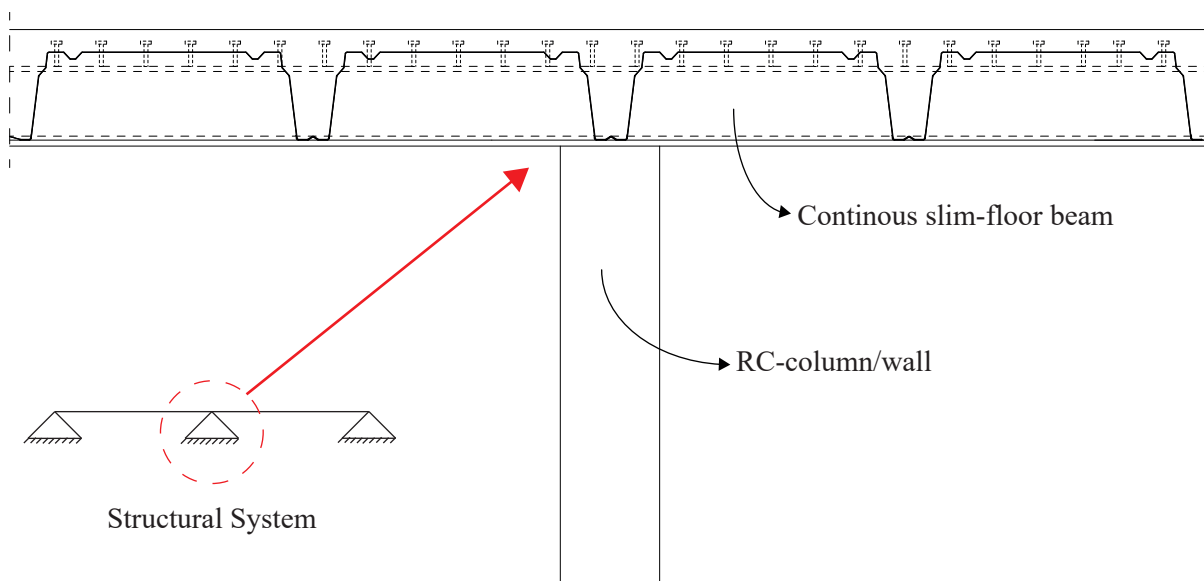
Illustration of continuous slim-floor beam of steel-concrete hybrid building systems.
